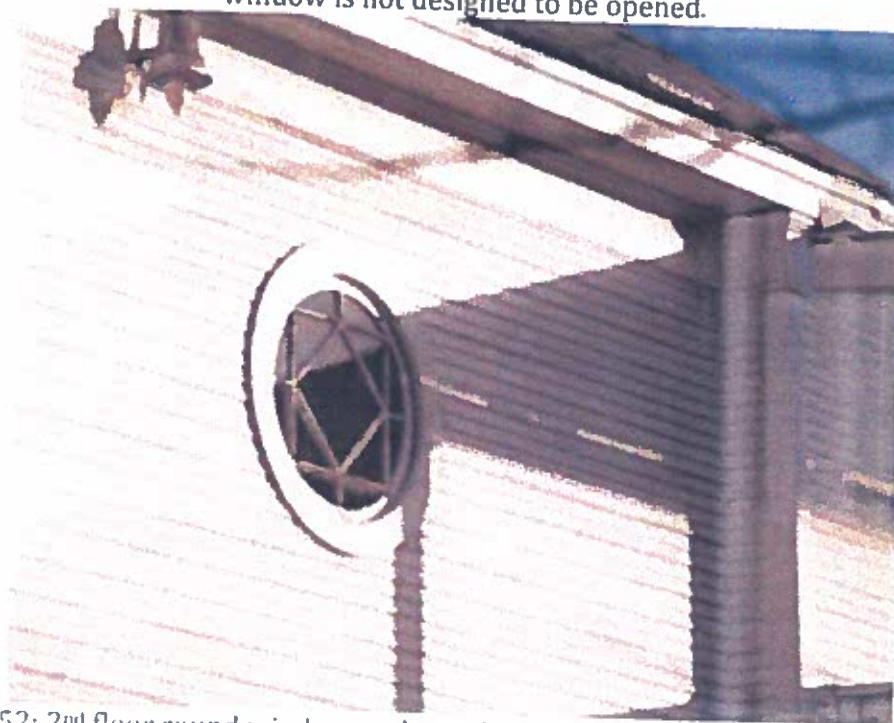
2<sup>nd</sup> floor round window to the middle room. This window is not designed to be opened.
